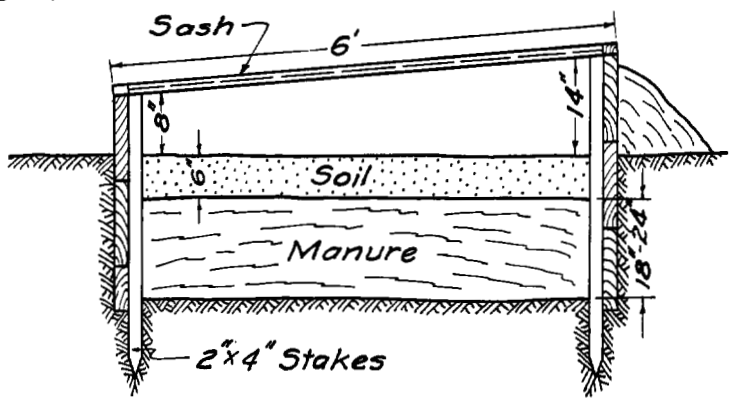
Cross section of a manure-heated hotbed with wooden walls.
